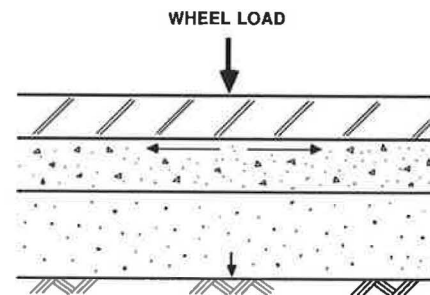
Subgrade deformation and AC tensile strain criteria used for flexible pavement design.
